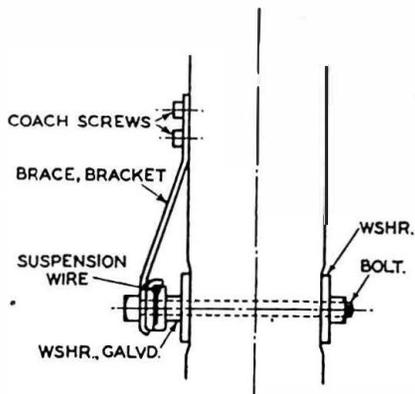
METHOD OF ATTACHMENT FOR SUSPENSION WIRE.
